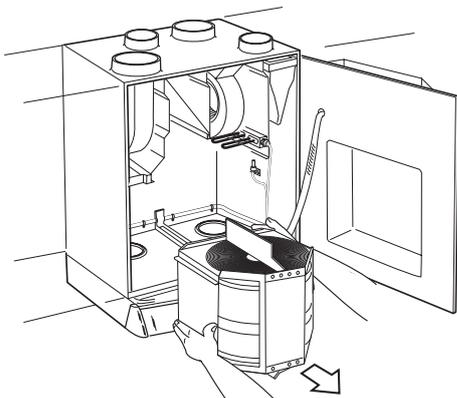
The heat exchanger package is removed from the unit. The electrical connection to the impeller motor is disconnected.
